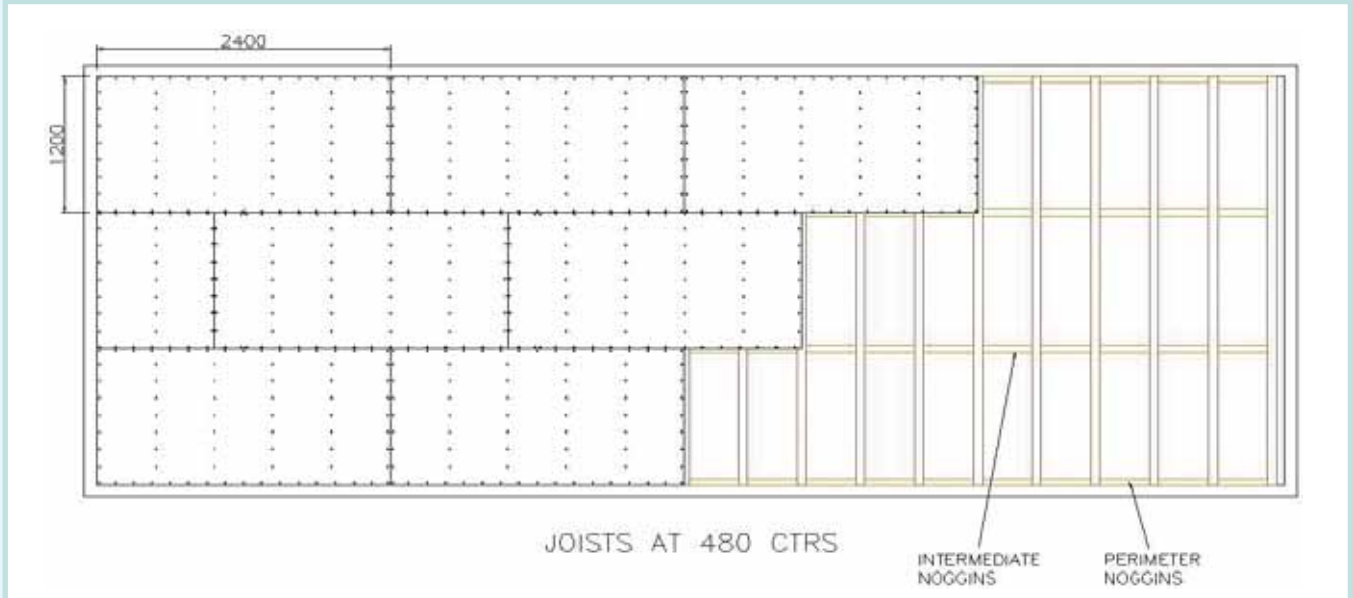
12.5MM PLASTERBOARD LAYOUT FOR DIFFERENT JOIST CENTRES
